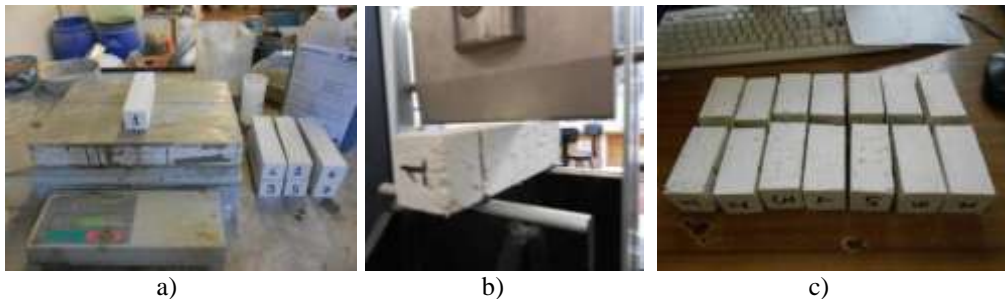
a) Laboratory balance; b) Set-up machine; c) Failure mode
